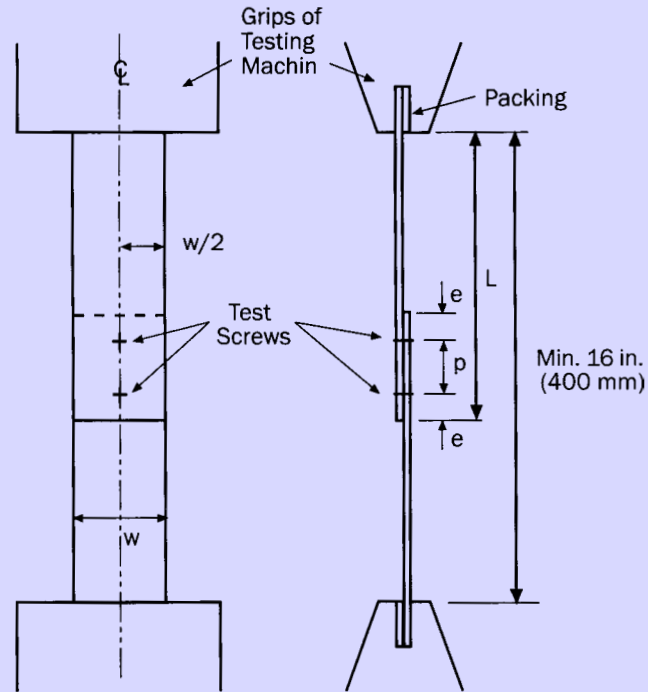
Standard Lap-Joint Shear Test - 2 Screws
